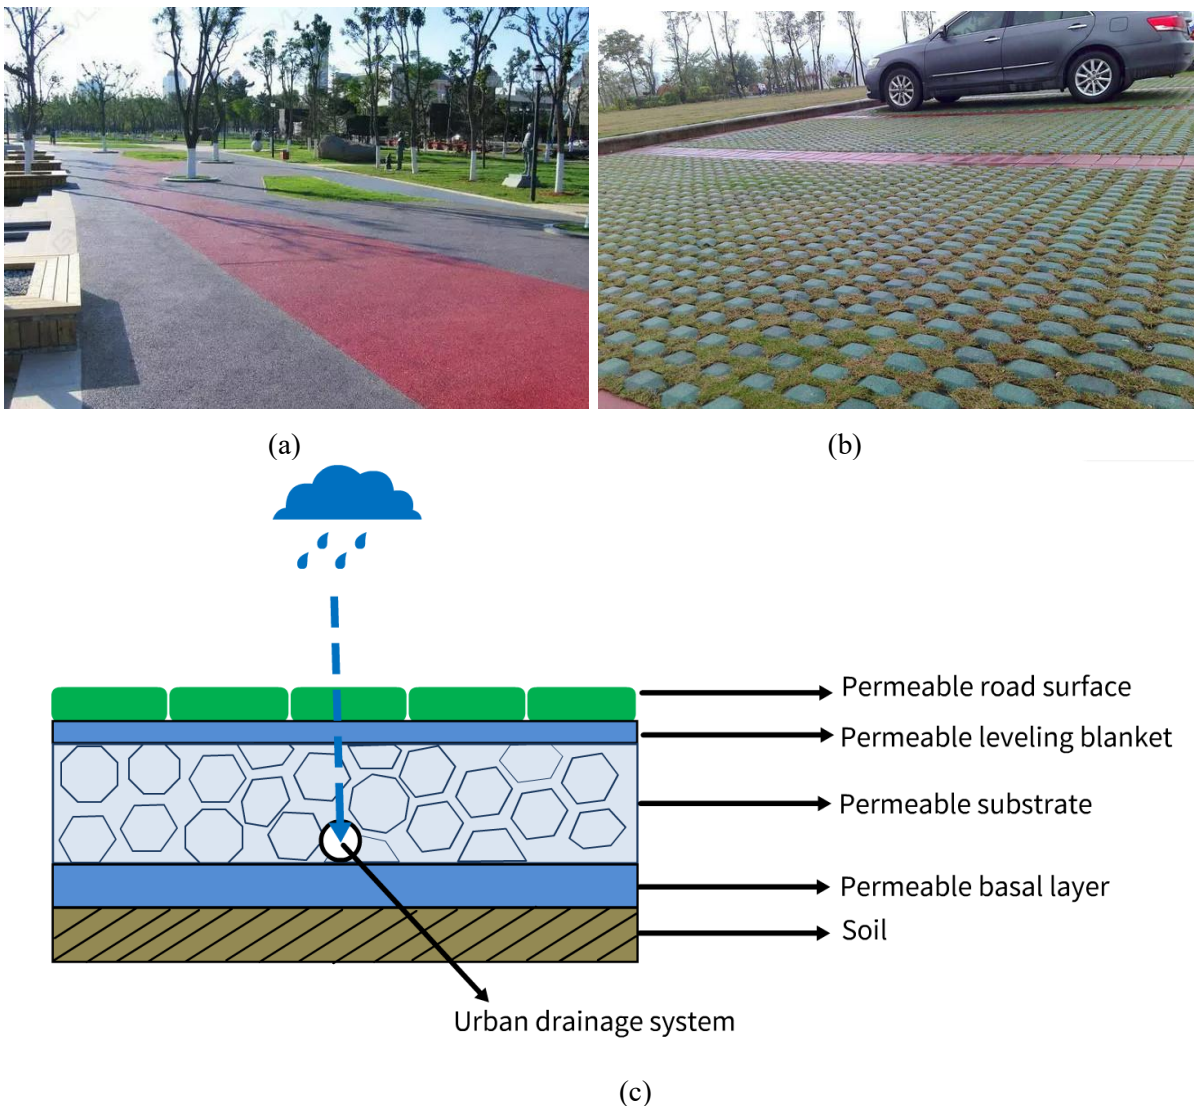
A permeable asphalt walking street in Guiyang (a). A grass-brick parking lot in Guiyang (b). (Yunfei Qi). A typical structure of a permeable pavement (c) (MHURD., 2014)
